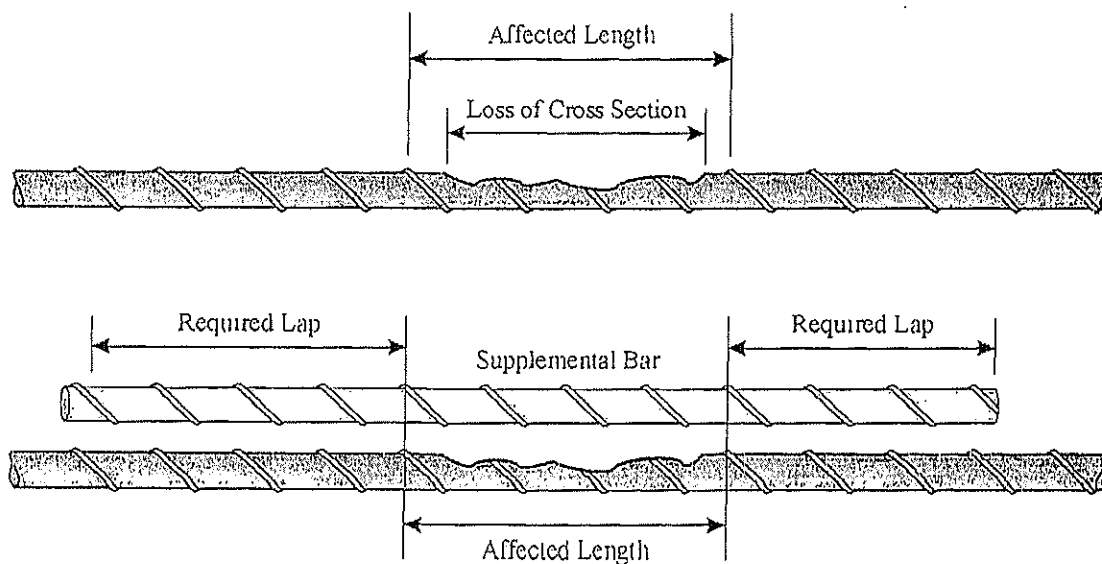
Repair of damaged/deteriorated reinforcing
